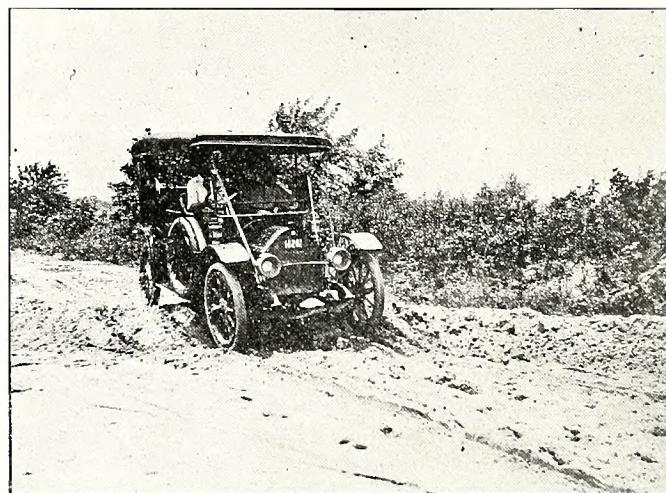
Road with steep grade (average 10 per cent.) Travel made more difficult by uneven surface of road; large stones project above the road.
